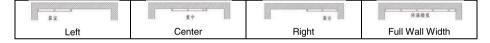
Construction Location Type of Perpendicular Wall (Plan Sketch)
